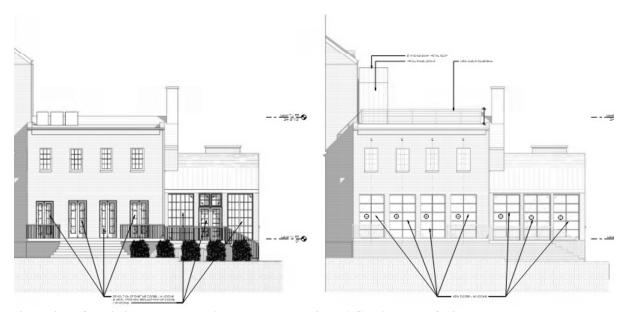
Left: existing south elevation; note that the 3 HVAC units on roof will be relocated and screened. Right: proposed elevation showing roof deck, elevator, and fenestration changes.
